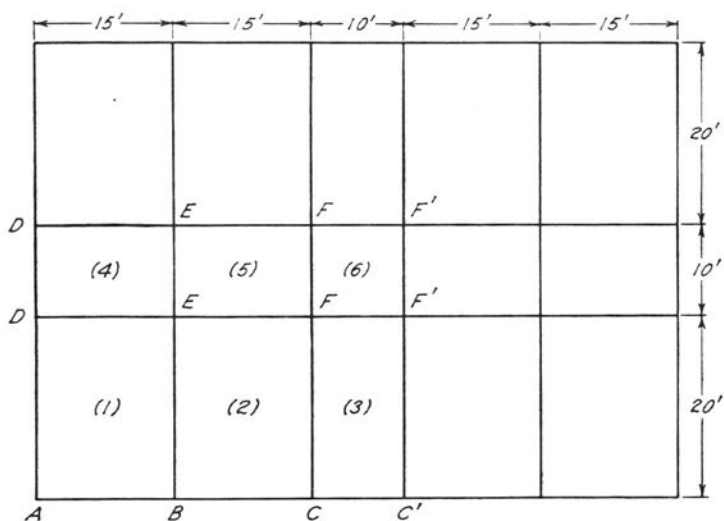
PLAN OF SLAB FOR ILLUSTRATIVE EXAMPLE
